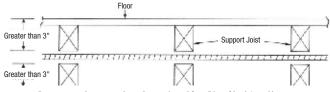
Penetration Point Greater than 3" from Edge of Stud, Joist, Plate, etc.
